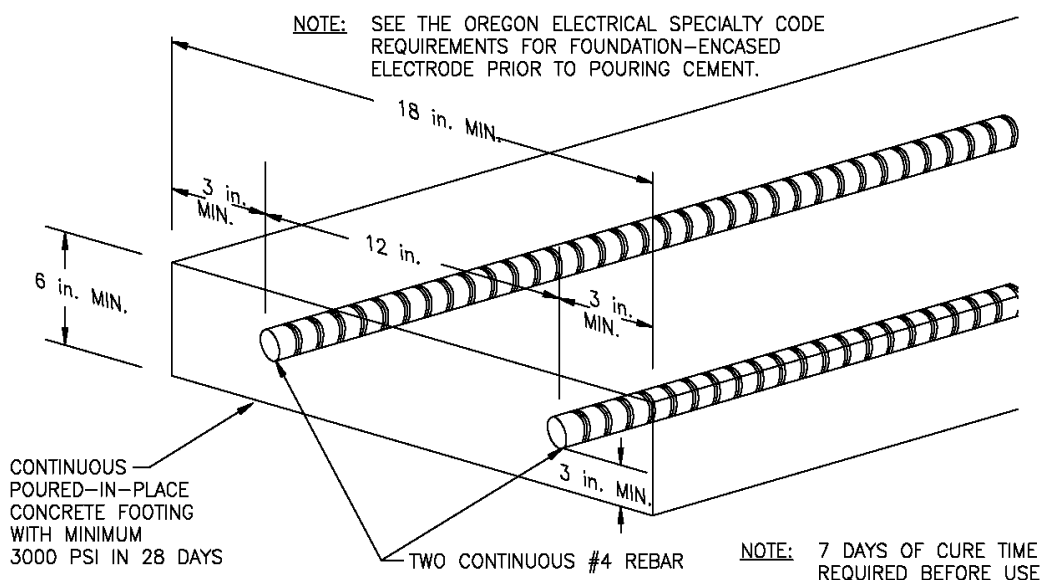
(a) Typical Individual Continuous Concrete Footing
